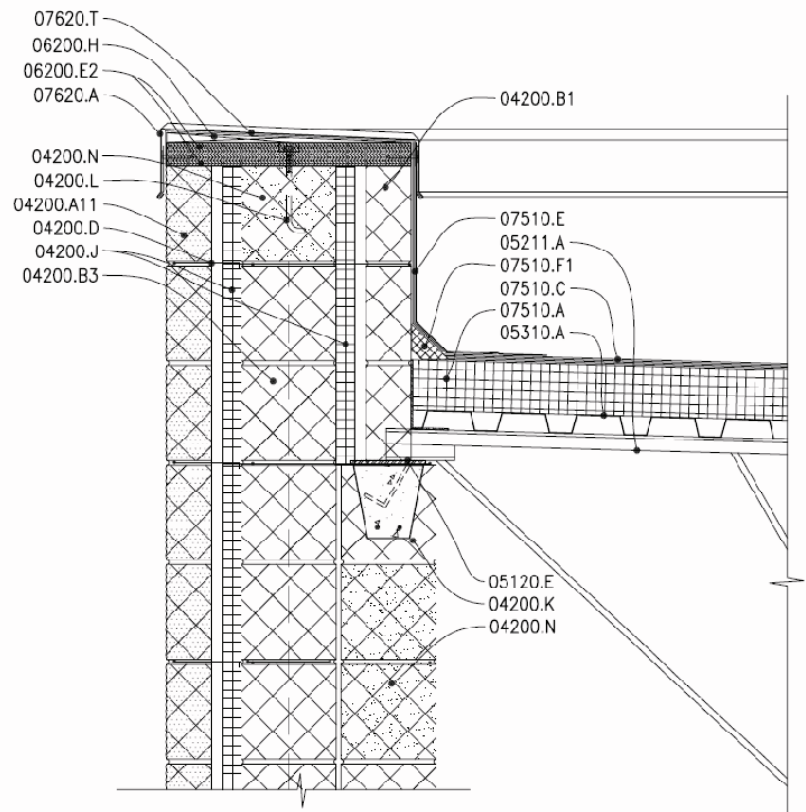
Typical Masonry Bearing Wall Joist Bearing Detail
